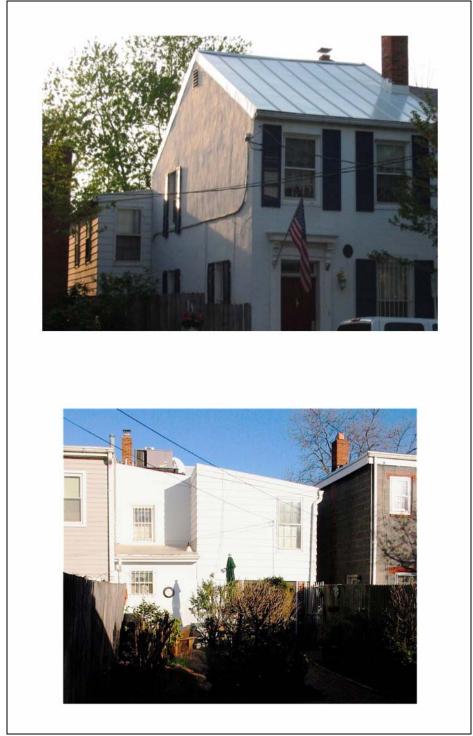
Front and rear elevations, 320 N. Patrick Street.
